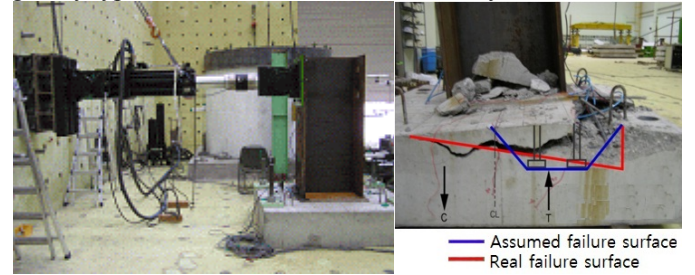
Real failure surface of the concrete block with group studs
